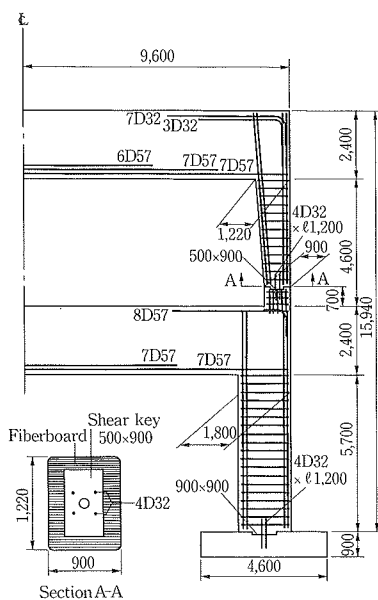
Dimension and Reinforcement Detail of B Type Bent-No. 88 (Ref. 14)
